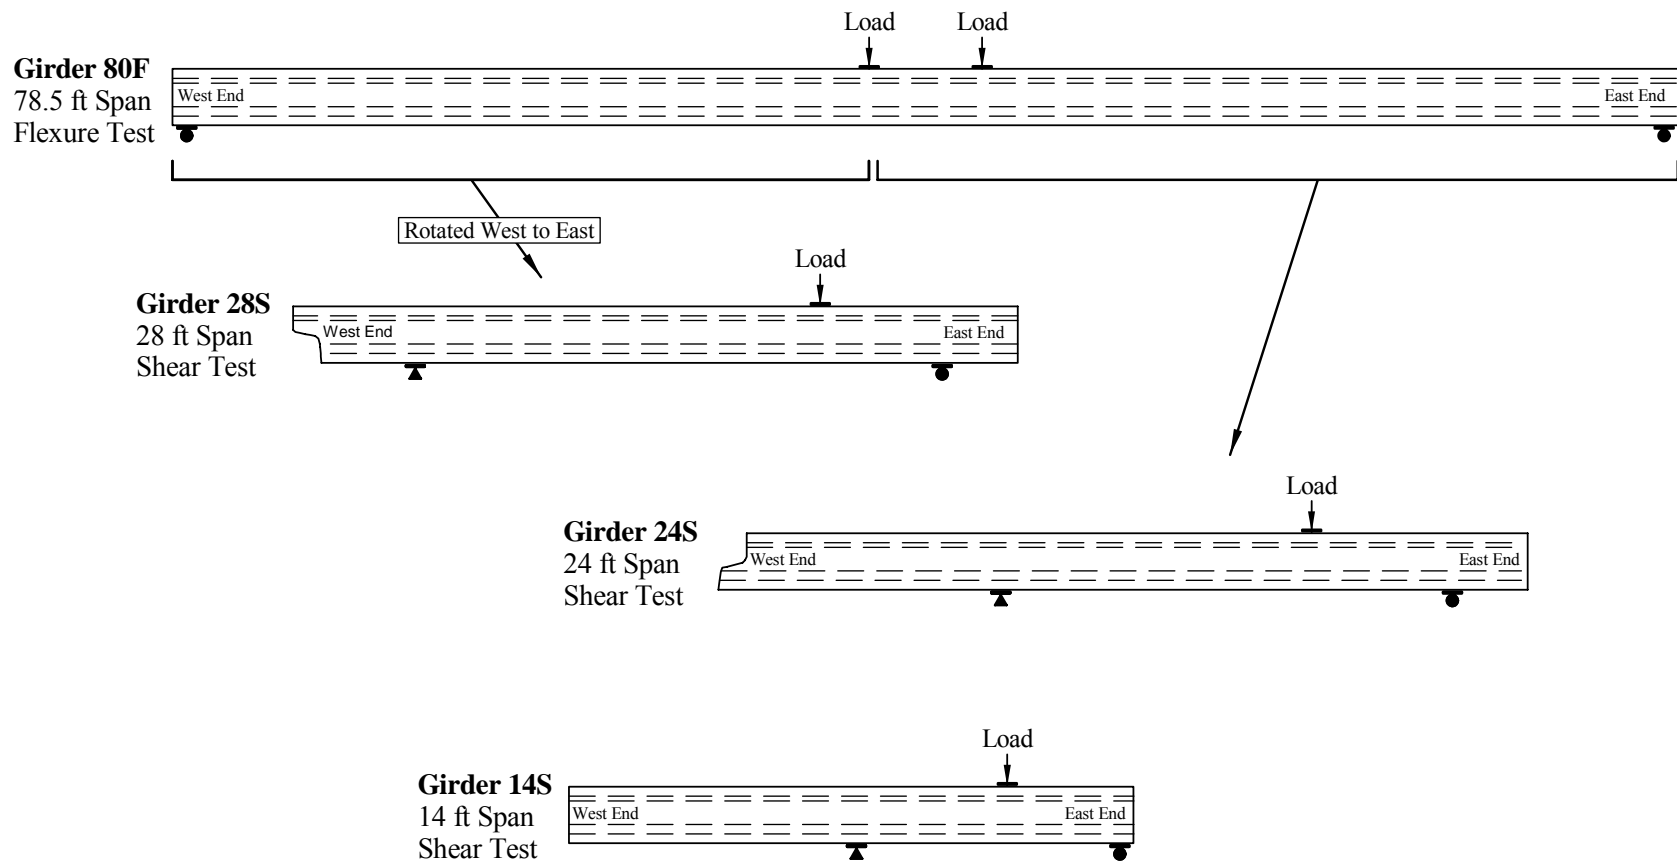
A: Origin of the four girder specimens, with the south elevation of the tested configuration shown
